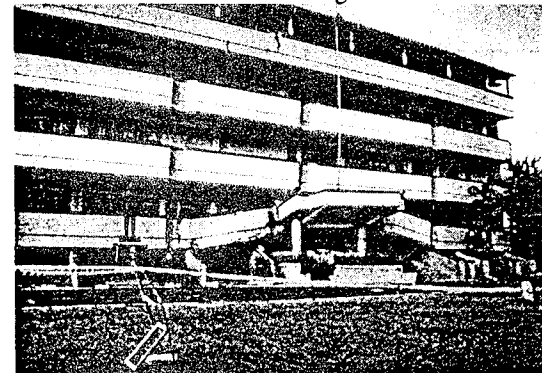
Elementary school in which first floor collapsed (Tunshih, Taichung County)
